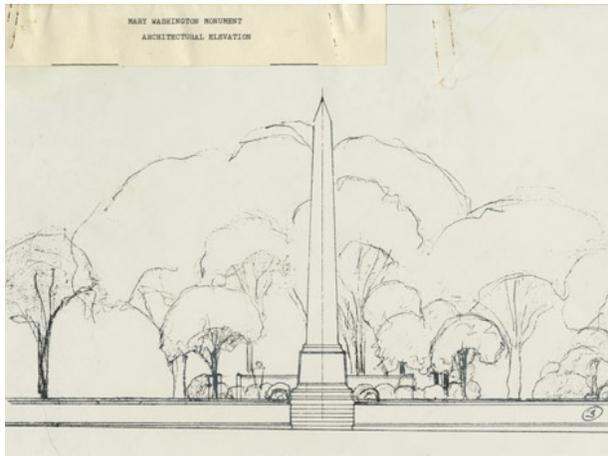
Alden Hopkins' 1937 drawing showing street view of monument, wall, stairs, and plantings.
